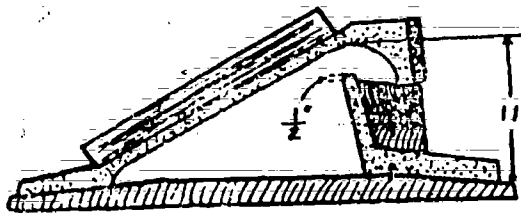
Sectional view after pouring the cement in bowl and trap. Note the concave shape of the base plate.
